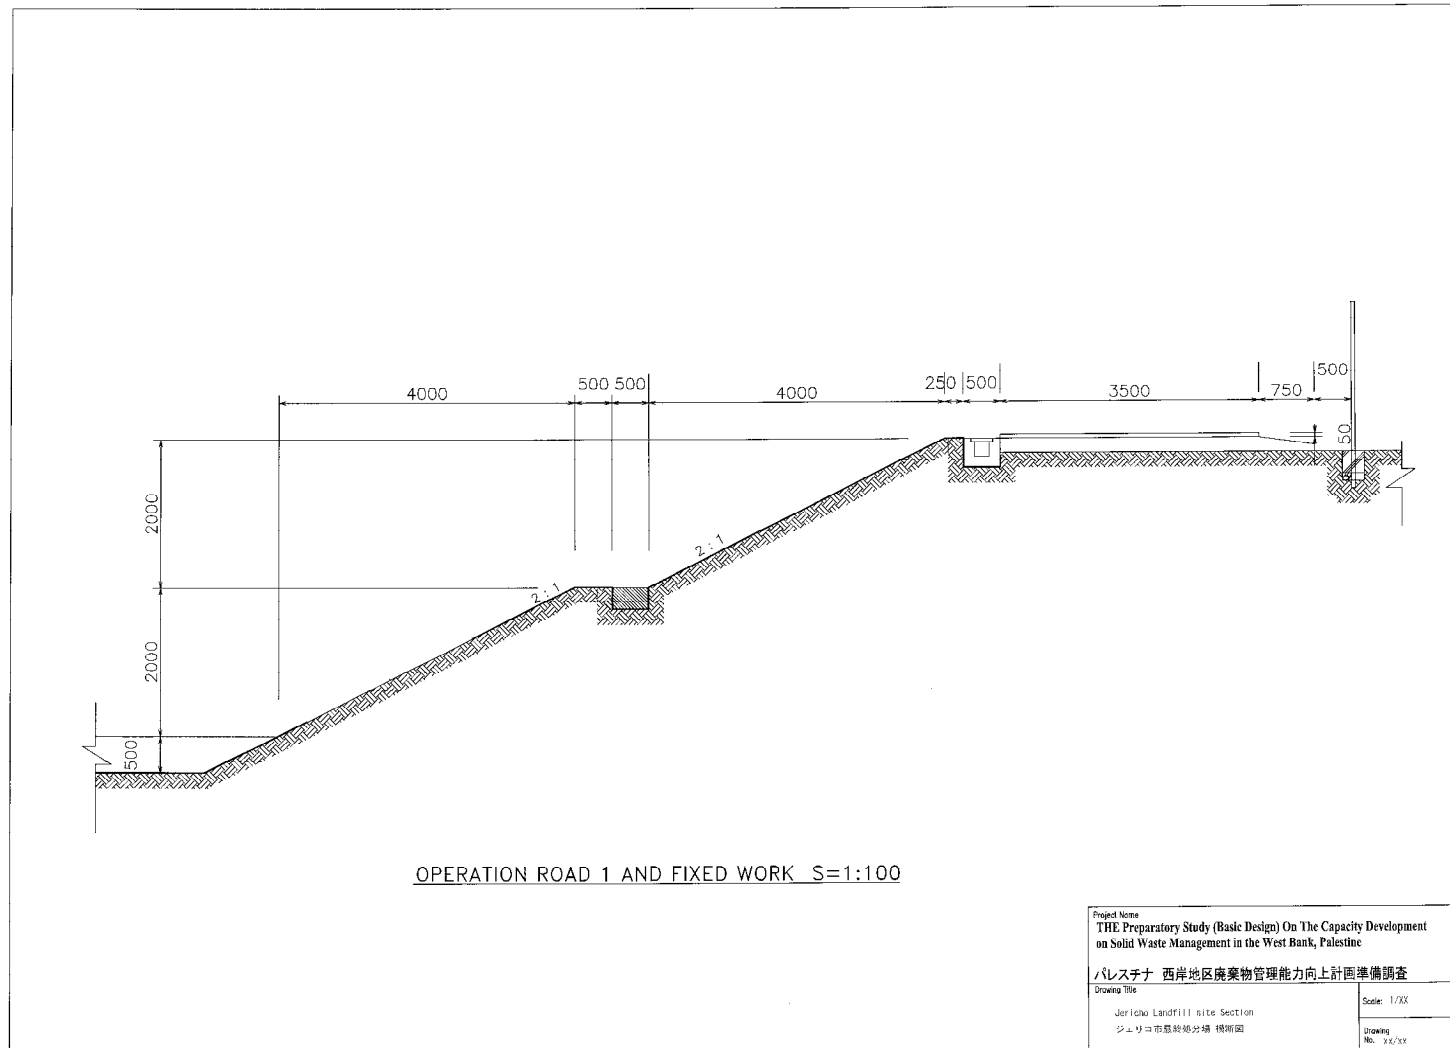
Detail Drawing 3 for Sanitary Landfill Expansion in Jericho
